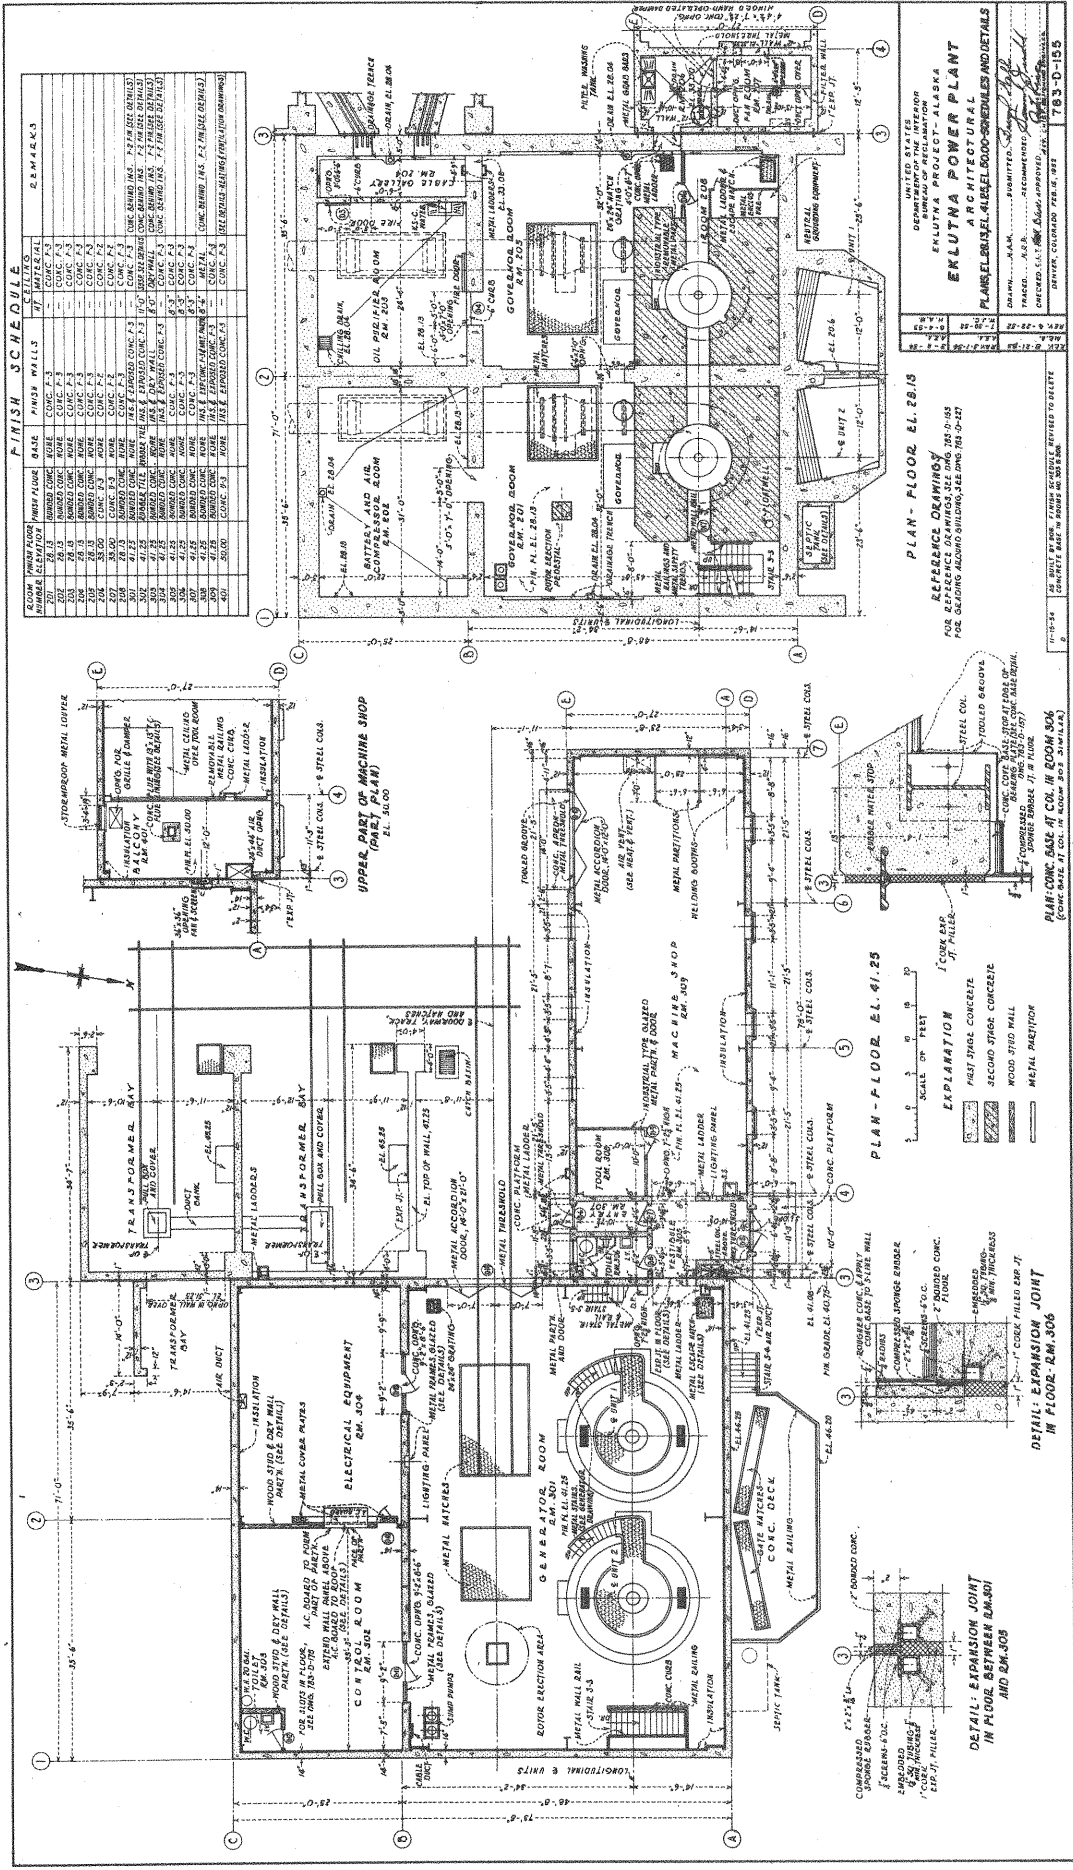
Architectural plans for powerplant at elevations 28.13, 41.25 and 50.00.
